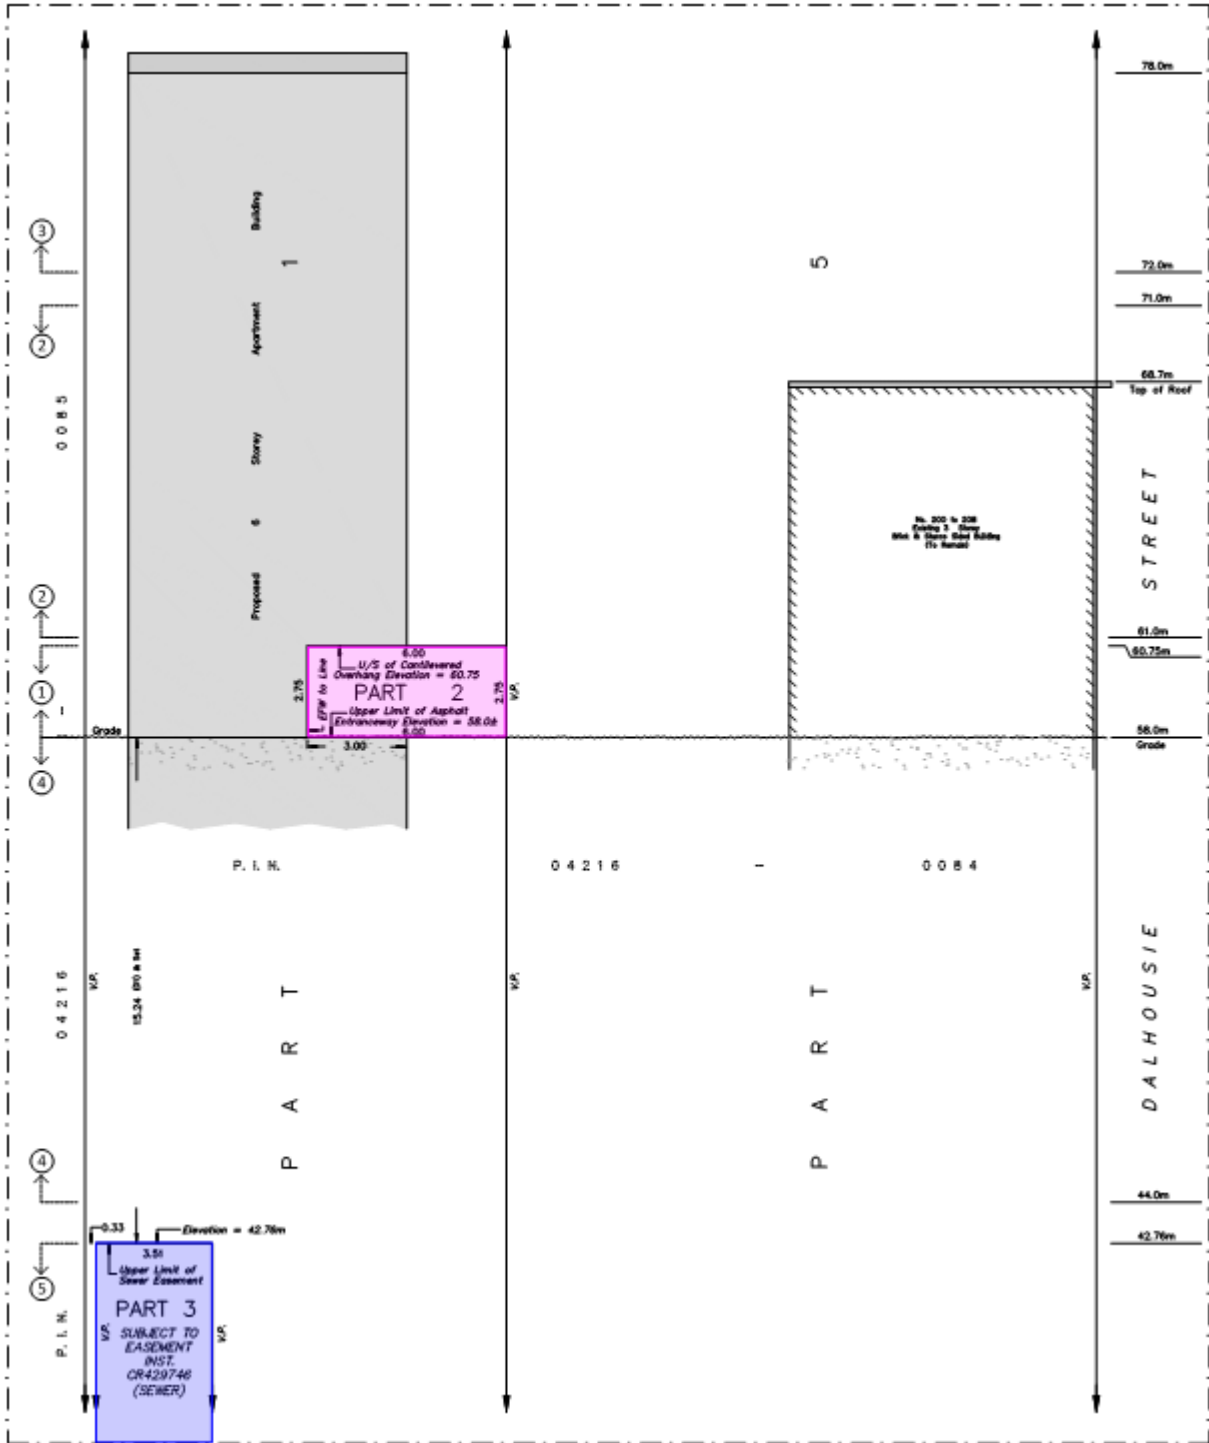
Section Drawing at the South End of the Subject Site Looking North
